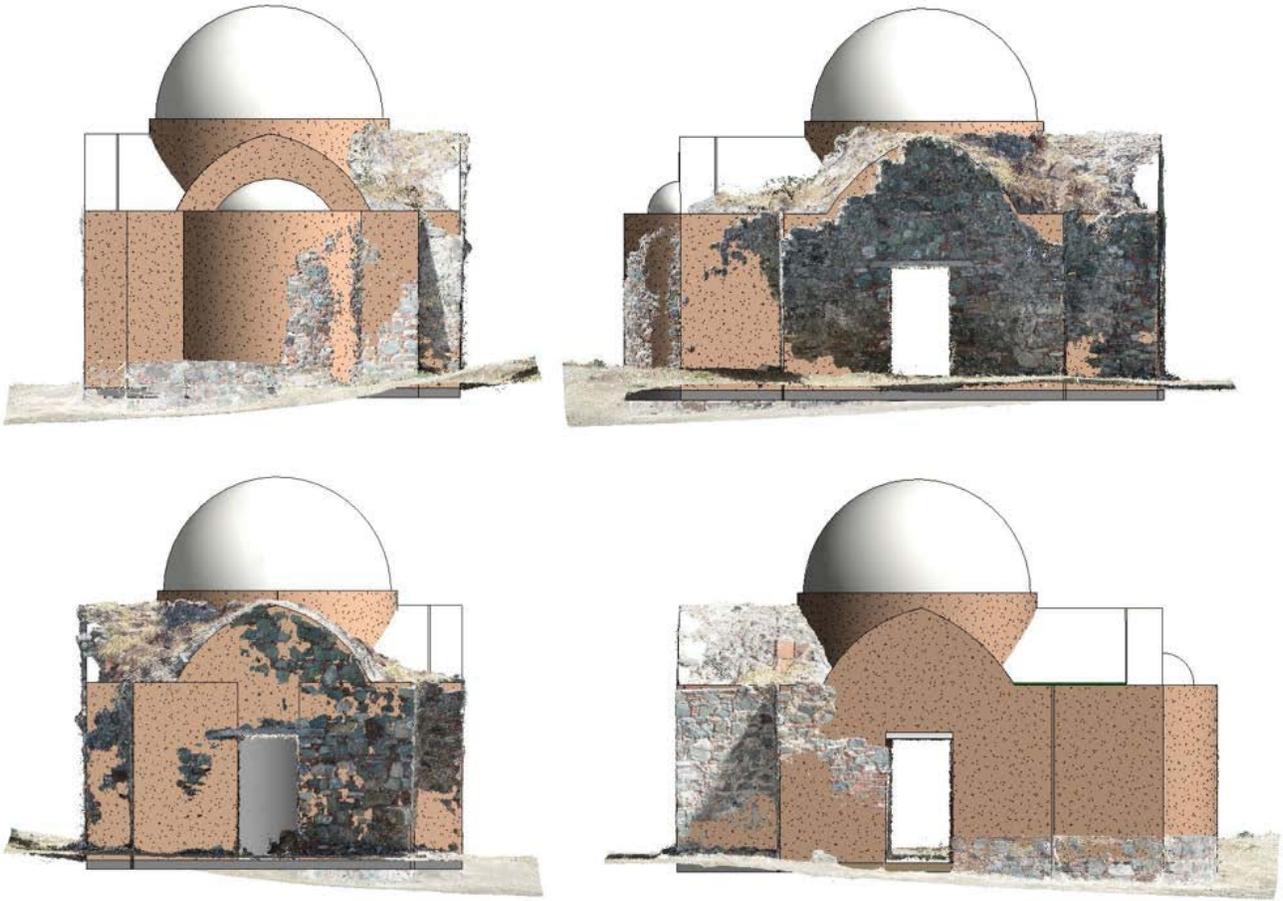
Elevations of reconstructed church from North, South, East and West with the original materials extracted from the digitized model
